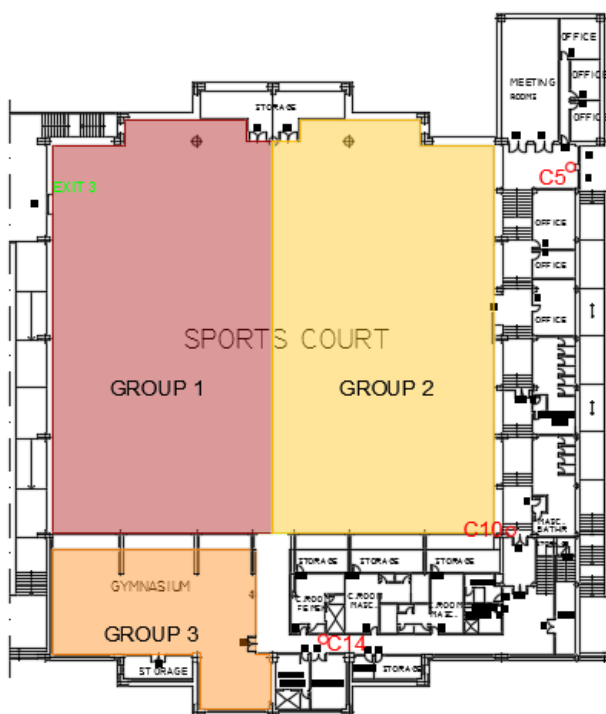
Plan of the floor -1 of the Sports Centre of the UC – (University of Cantabria, 2016)
